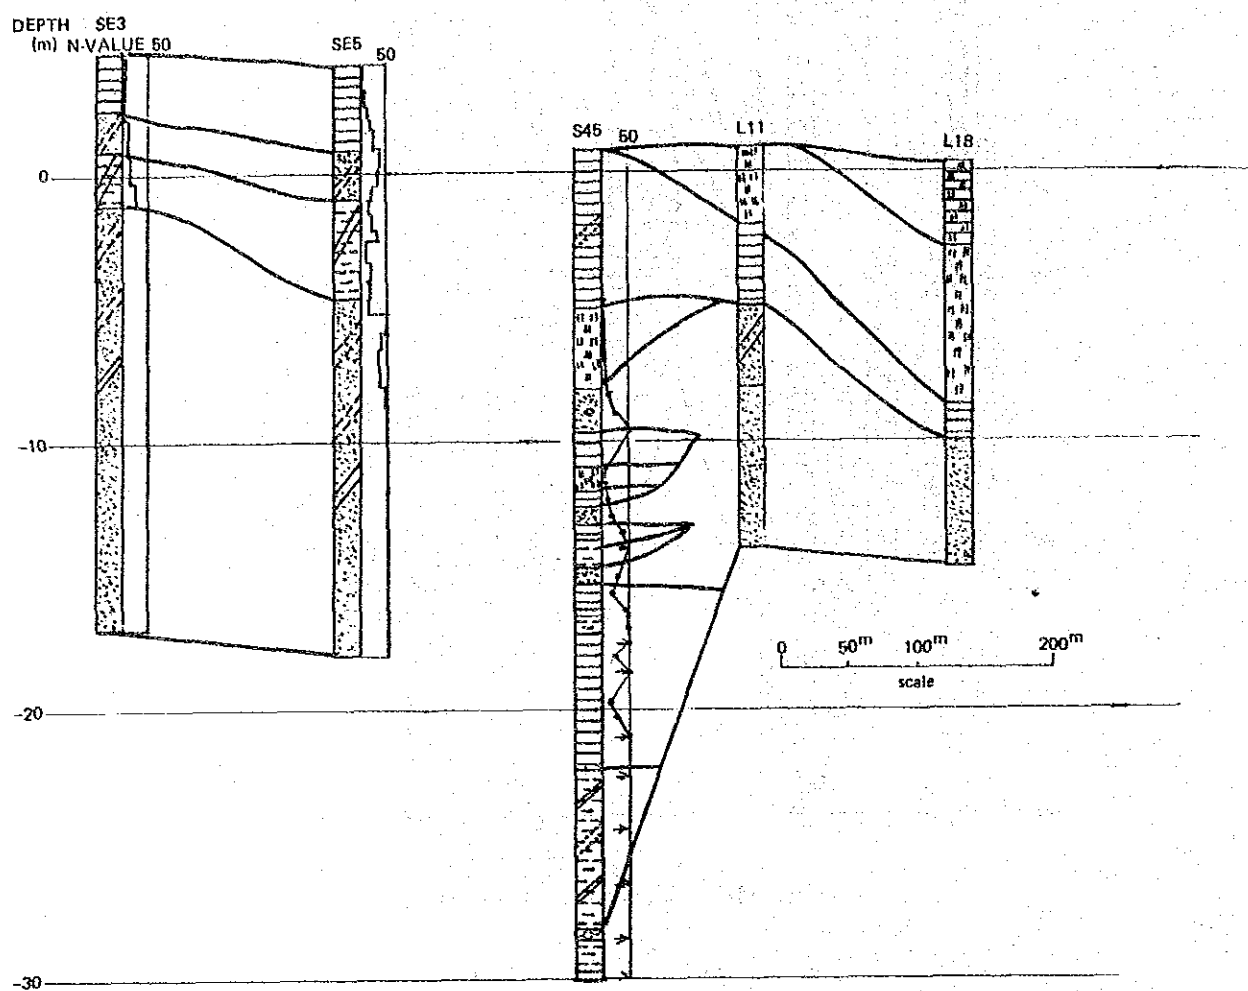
Soil Profile, Section ⑨ - ⑨
